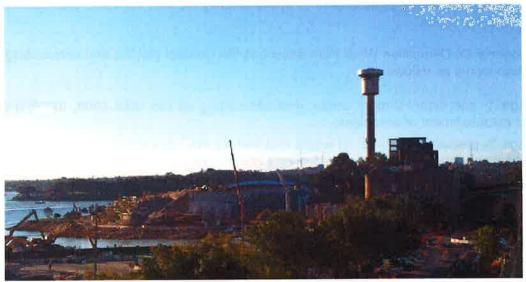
HCT viewed from High Street, Millers Point, looking north-west.
